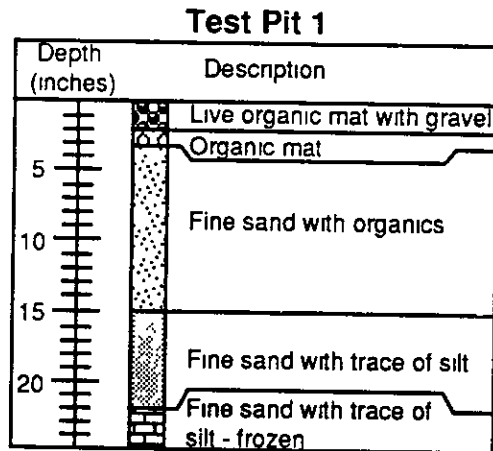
BAR-M TEST PIT LOGS NEAR NEW LANDFILL (SITE 4)
